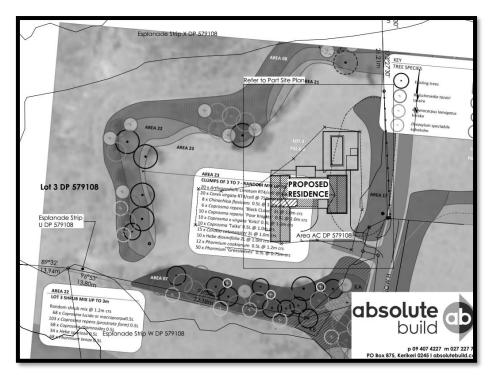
Proposed floor plan of dwelling with existing landscape plan overlay. Source: Absolute Build Plan
